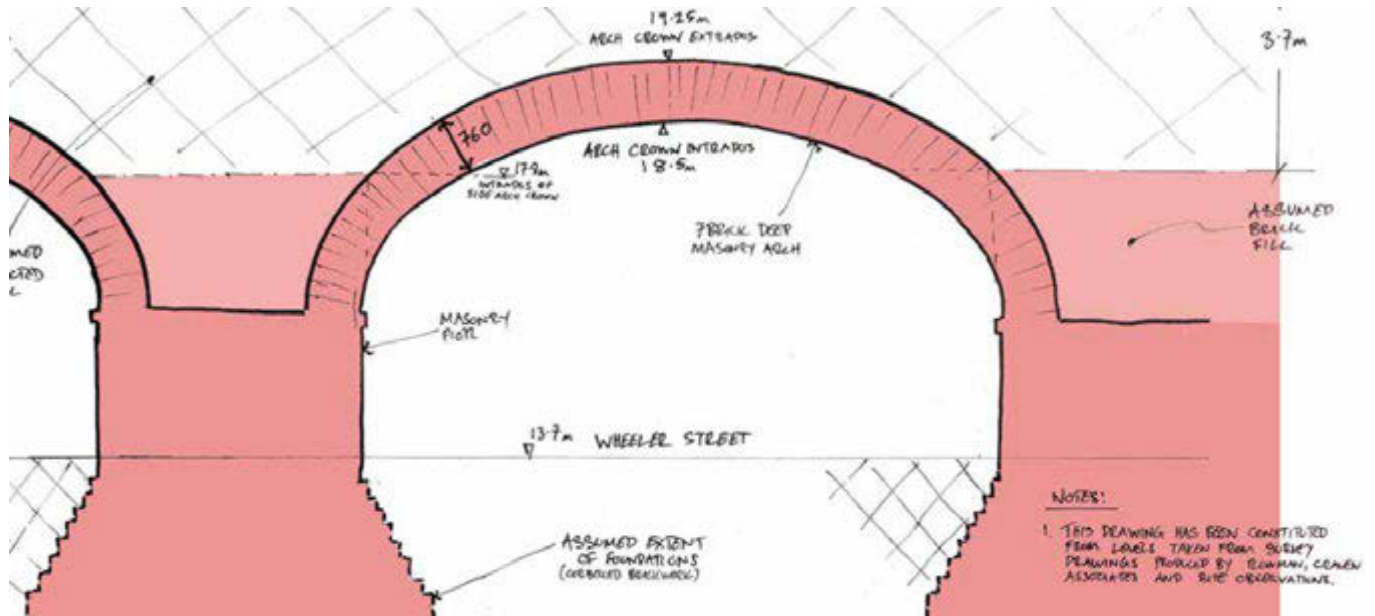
Typical section through the Braithwaite Viaduct over Braithwaite Street (formerly Wheeler Street)
